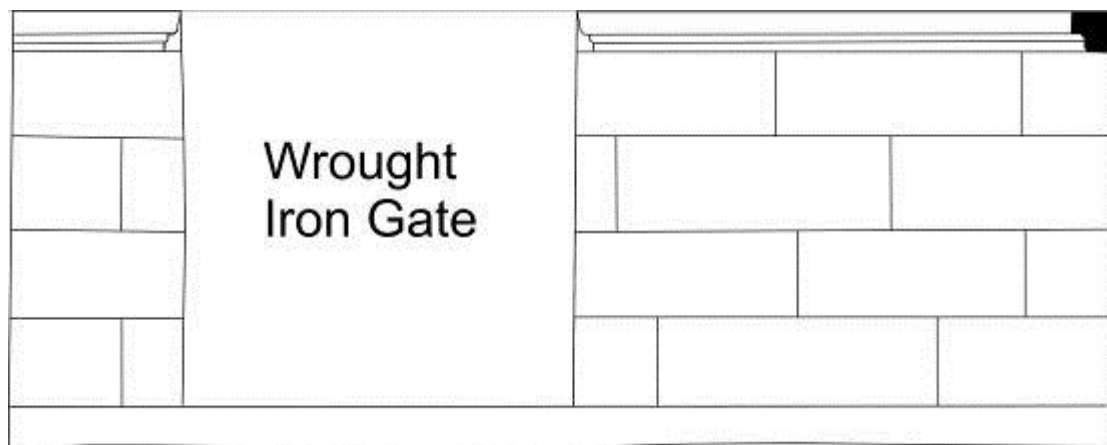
Drawing of east facing internal elevation of burial enclosure Scale 1:40
